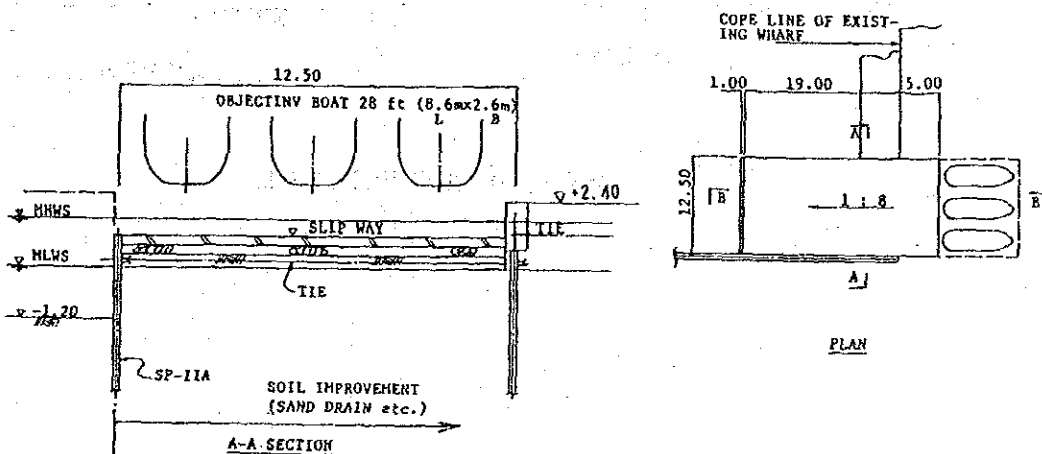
, TYPICAL SECTION OF SLIP WAY RAMP
